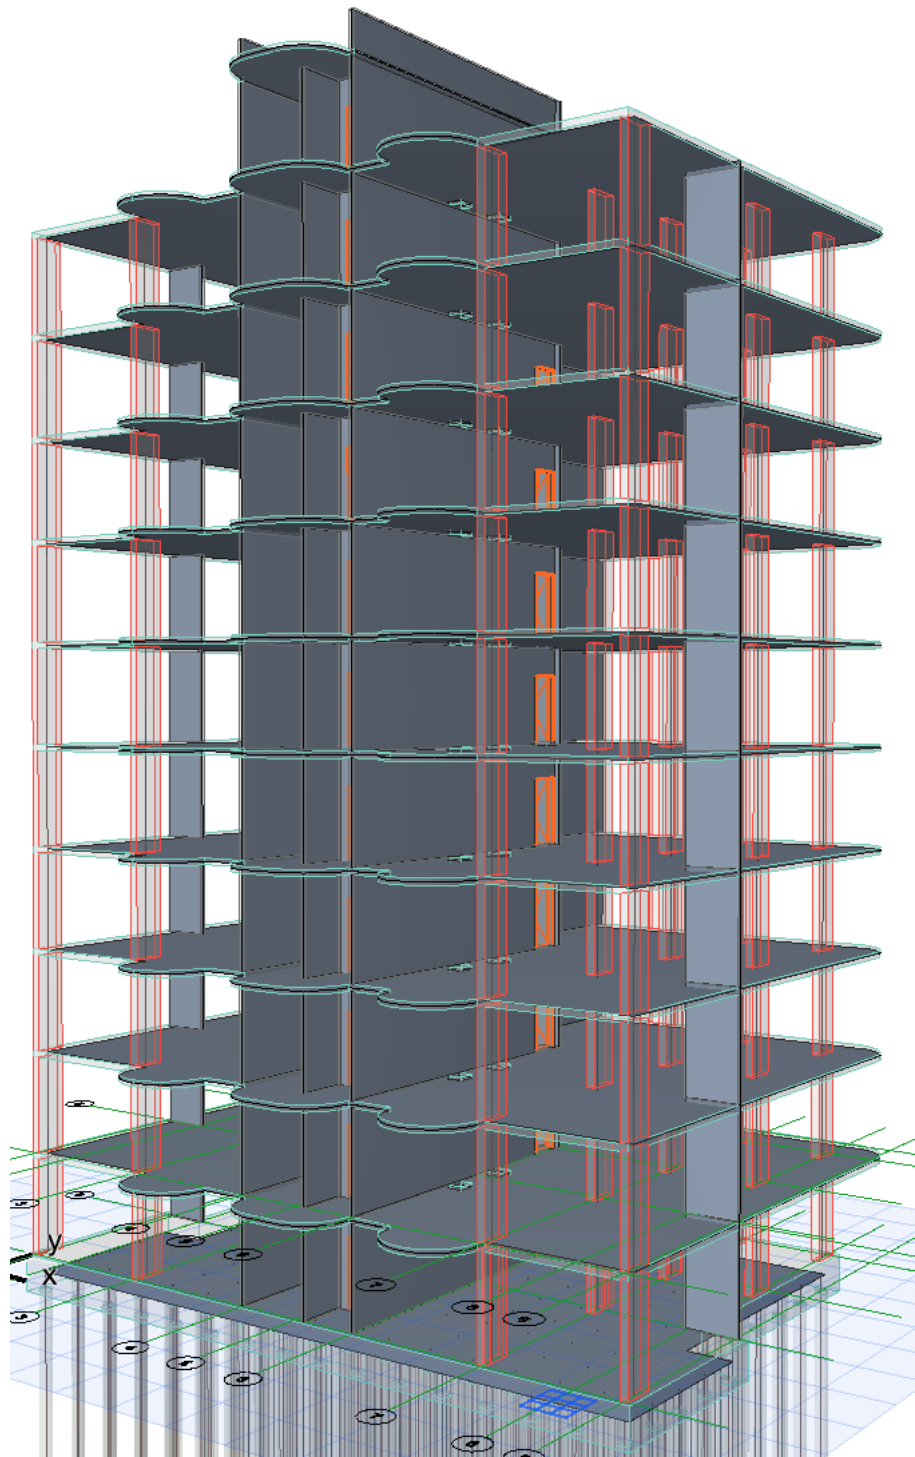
Structural analytical model of the building with piles in Archicad 25
